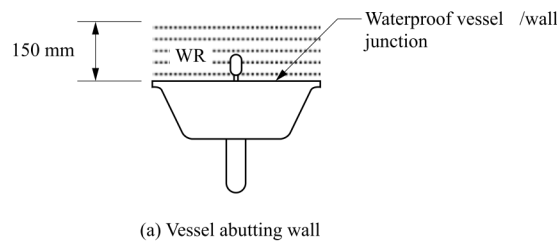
VESSEL ABUTTING WALL -
